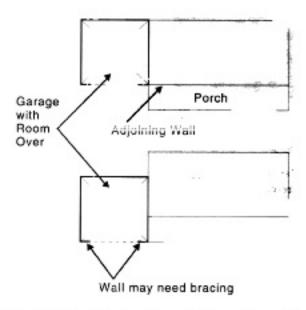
Additional bracing, If the wall of the main house is in line with the wall containing the door of a garage with a room over it (top figure), the adjoining wall will help brace the garage. If the "in-line" wall consists only of porch supports (bottom figure), the garage may require additional bracing.
